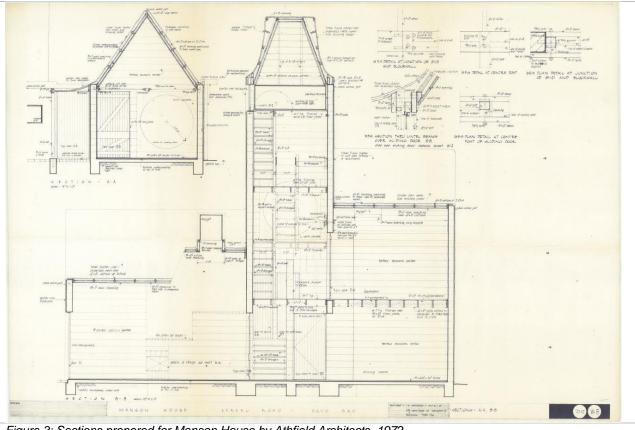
Sections prepared for Manson House by Athfield Architects, 1972.
